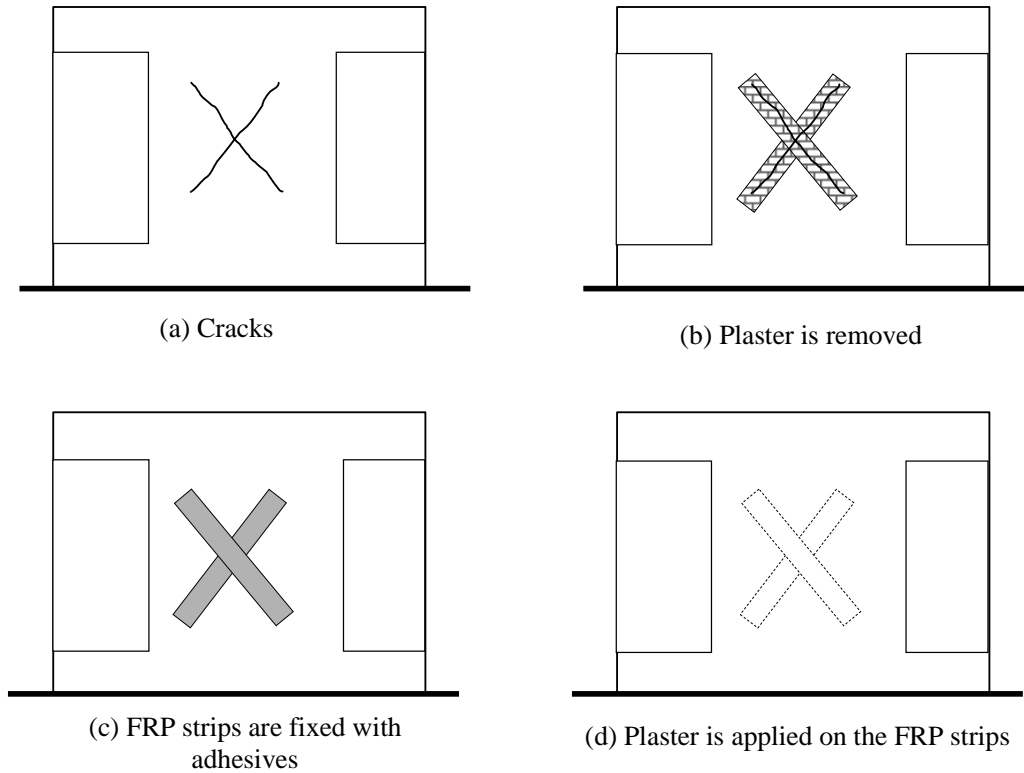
Steps in repairing cracks in a masonry wall using FRP strips
